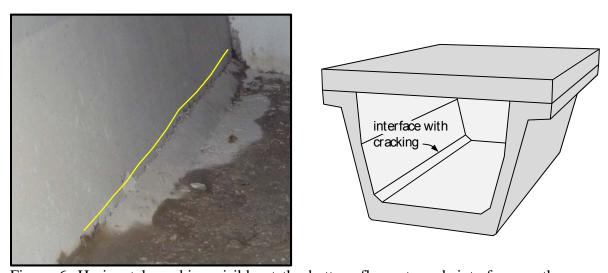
Horizontal cracking visible at the bottom flange-to-web interface on the inside of test specimen B2N.
